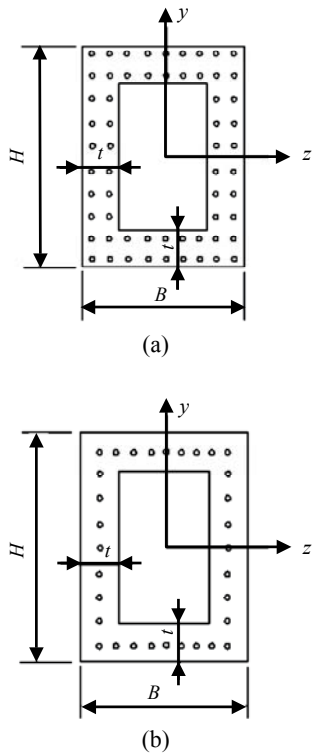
Typical box section types of reinforced concrete beams. (a) Box section with double reinforcements; (b) Box section with single reinforcements
